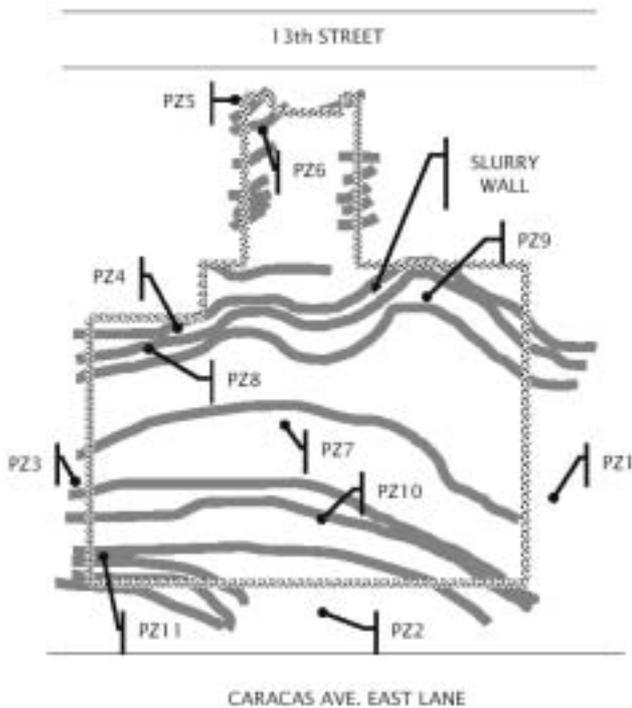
Plan view of the project showing the location of piezometers and sand layers identified during construction underneath the deposits.
